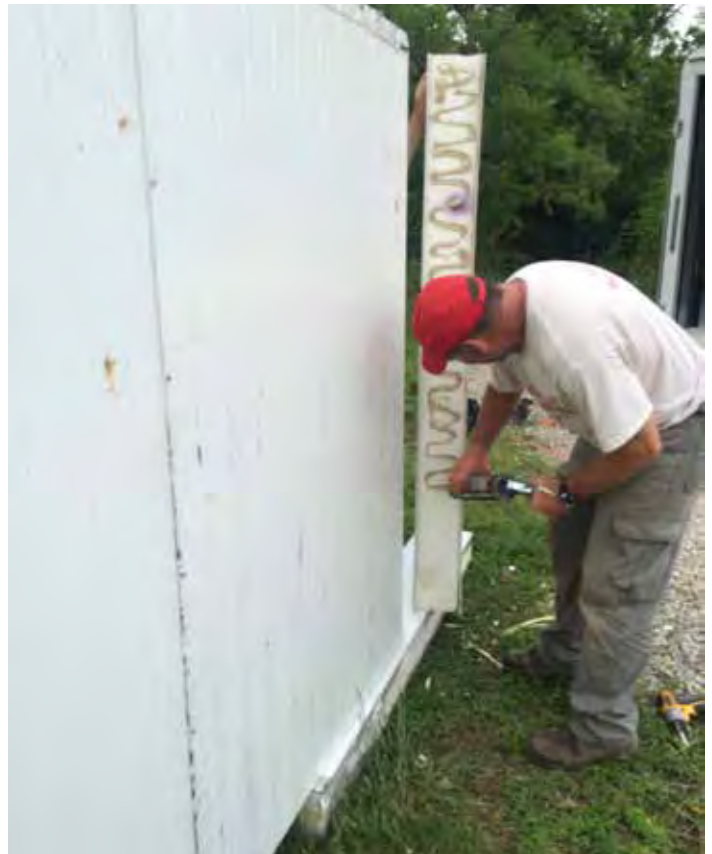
The panels are assembled with construction adhesive and self-tapping screws at the tongue-and-groove joints.
